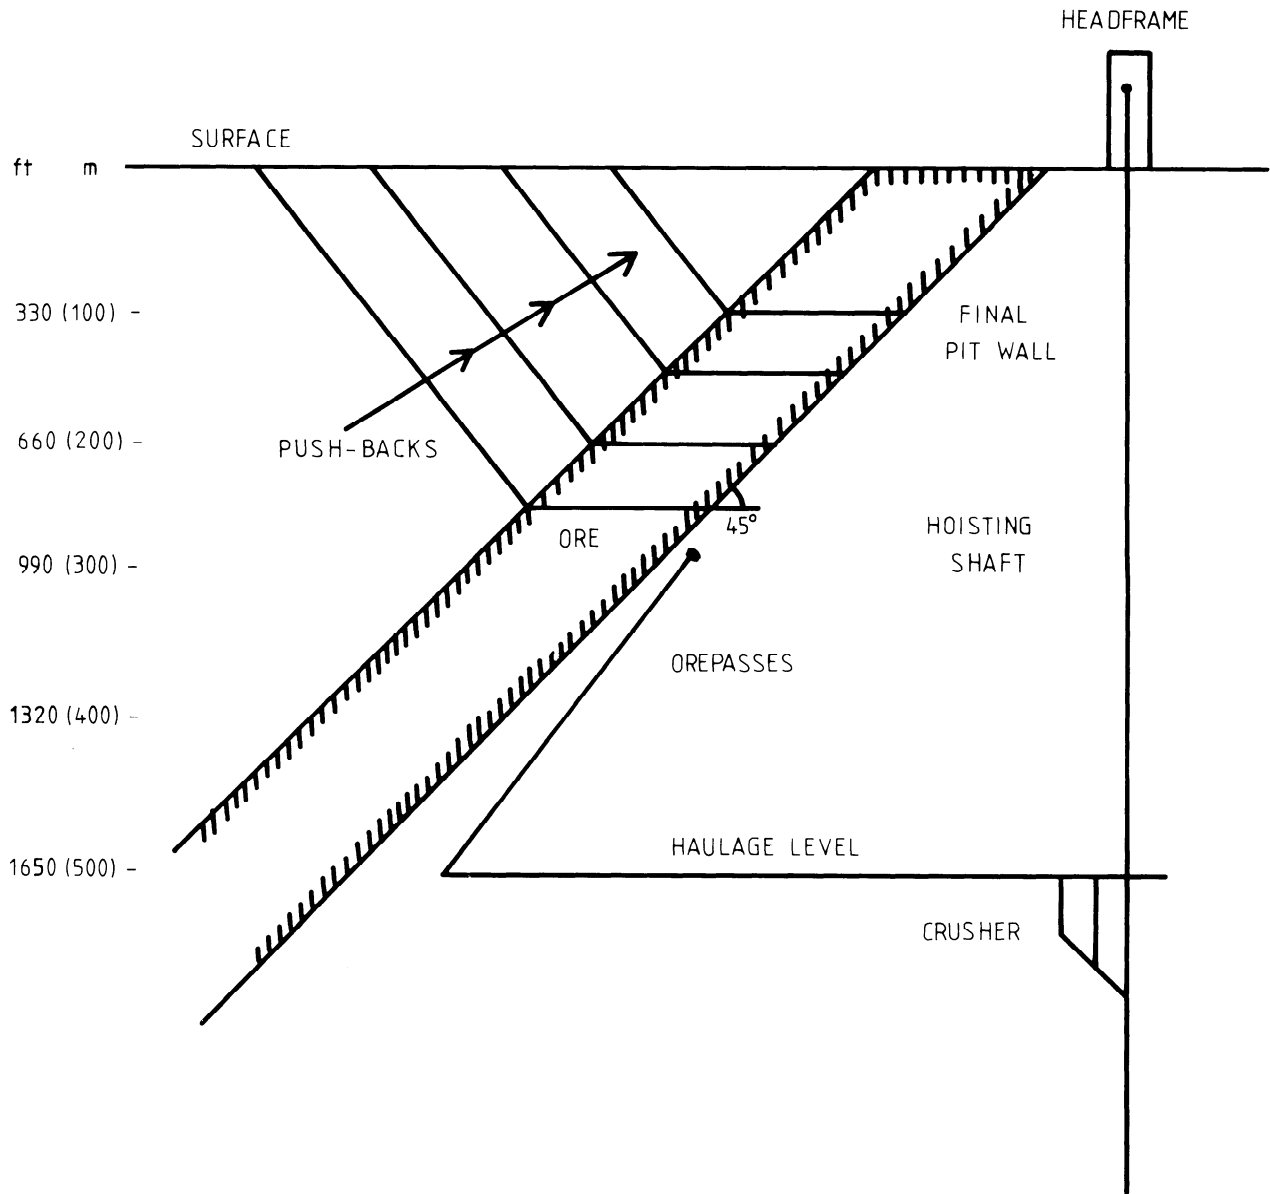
Cross section through hypothetical steeply dipping copper deposit.
